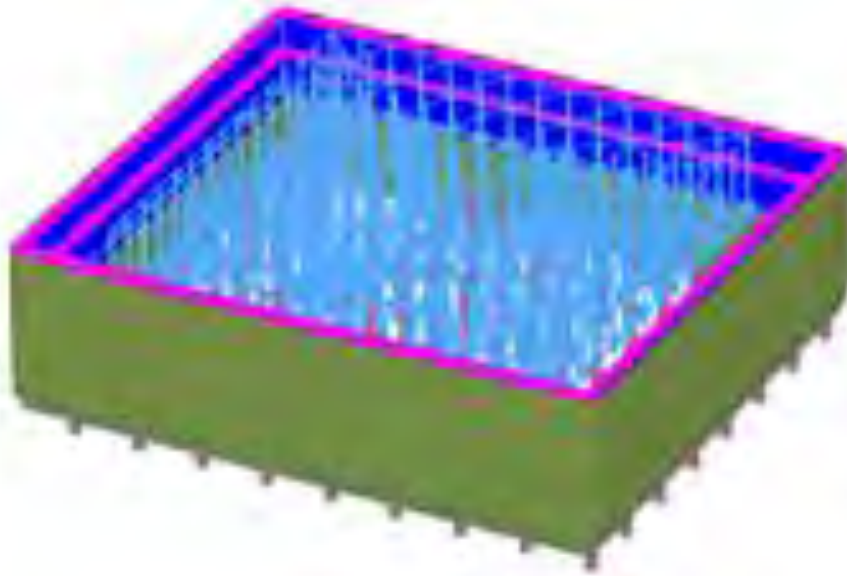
Connectivity plot of finite element model containing sheet pile wall retaining system
